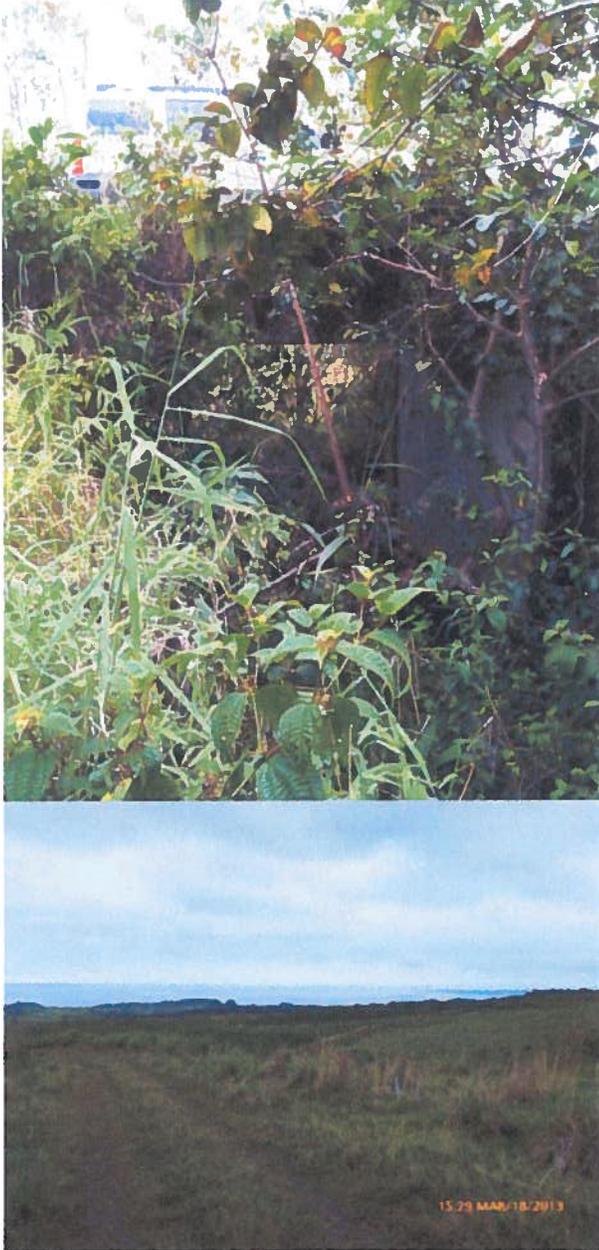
A concrete culvert (top) allows the old sugar company road (bottom) to safely cross the drainage in the Northern parcel.
